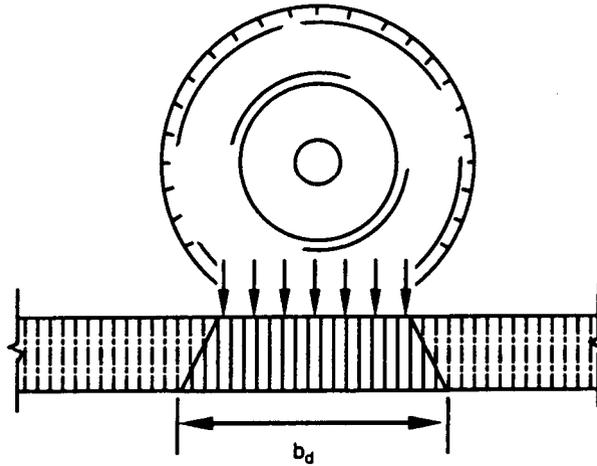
Wheel load distribution perpendicular to deck span.
